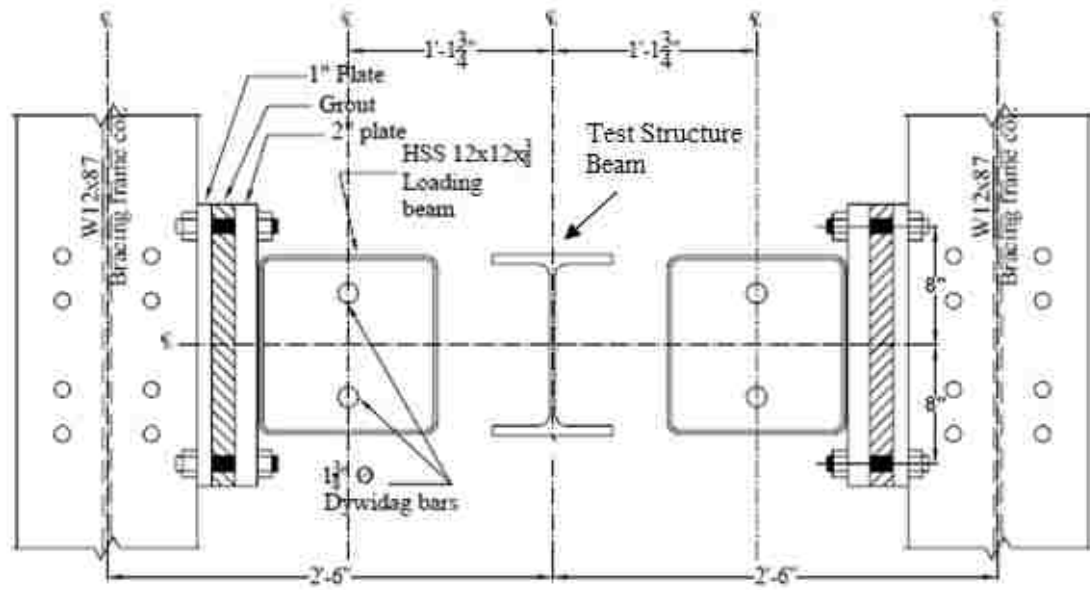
Bracing of Loading Beam by Bracing Frame (Gonner 2009)
